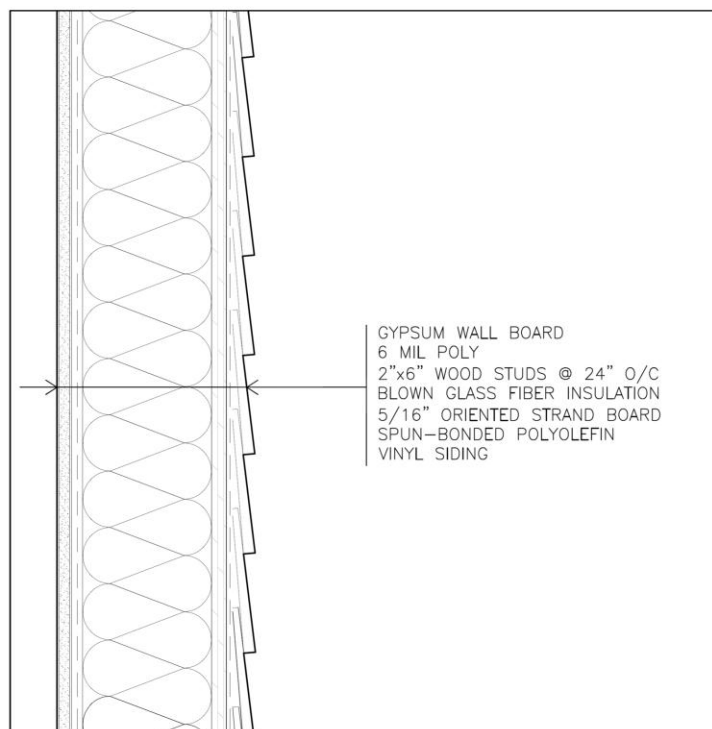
Wall Assembly Cross-Section (Twiddy, 2011)
